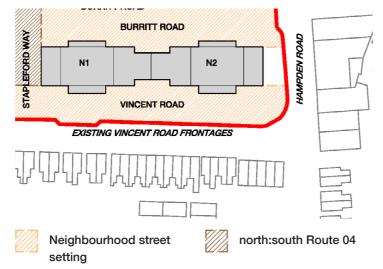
Key plan. Figure 7.84: Building composition plan.
